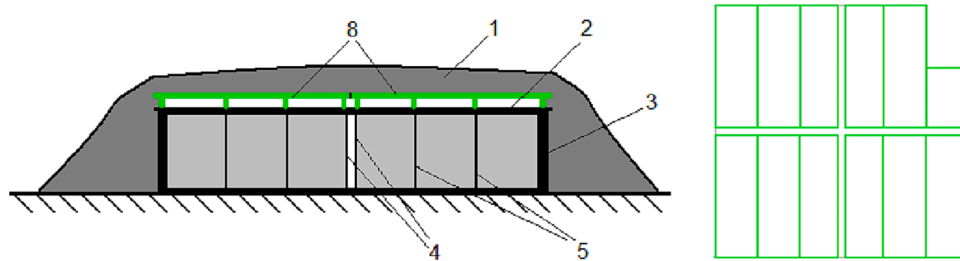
Engineering barrier constructed by pouring soil layer of the barrier on the additional structure rested on the floor of the storage facility along all walls (flooring of the first floor) (including partitions between canyons).
